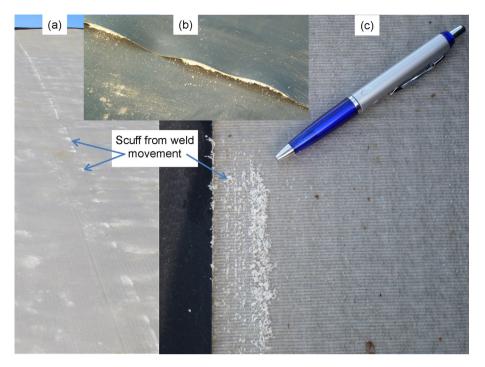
Scuffing of the 100 μ m polypropylene coating of GCL8 due to the movement of weld due to thermal expansion and contraction of the geomembrane: (a) scuffing of the GCL coating along almost entire weld, (b) coating material accumulated on the lower geomembrane overlap at the weld, and (c) polypropylene coating accumulated on weld overlap and scuffing of GCL.
